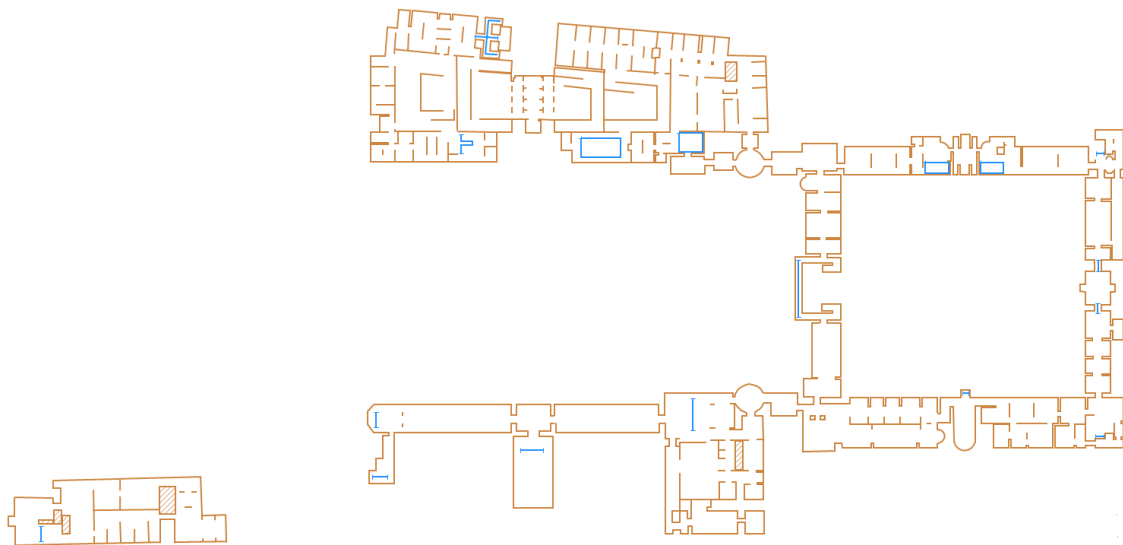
The Floor Plan of *Musée du Louvre* G Floor
